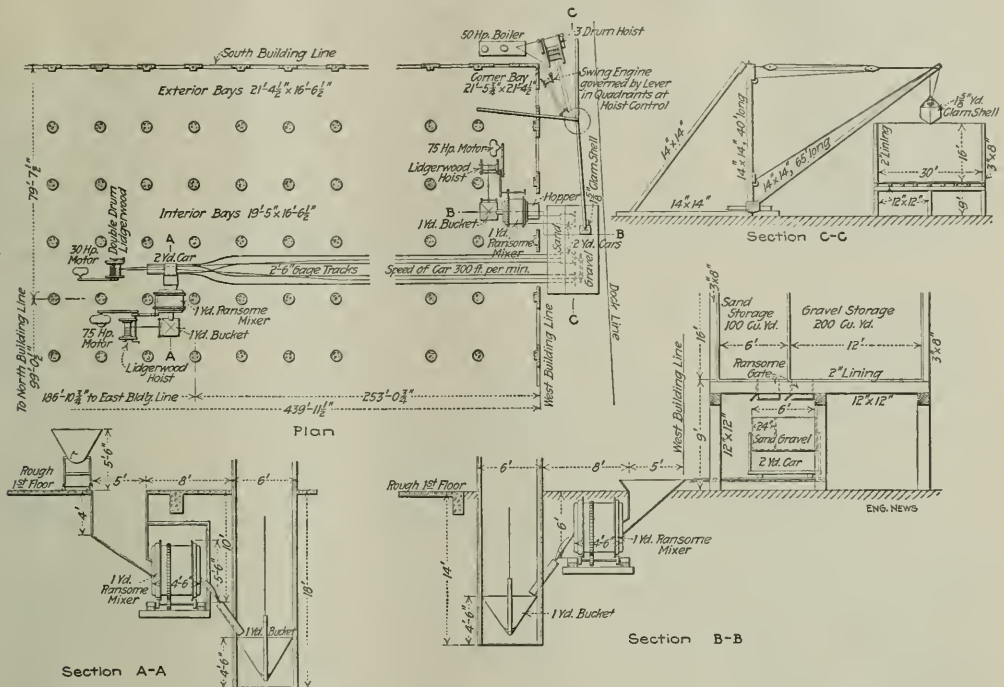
DETAILS OF CONCRETING PLANT ON AUSTIN-NICHOLS BUILDING
